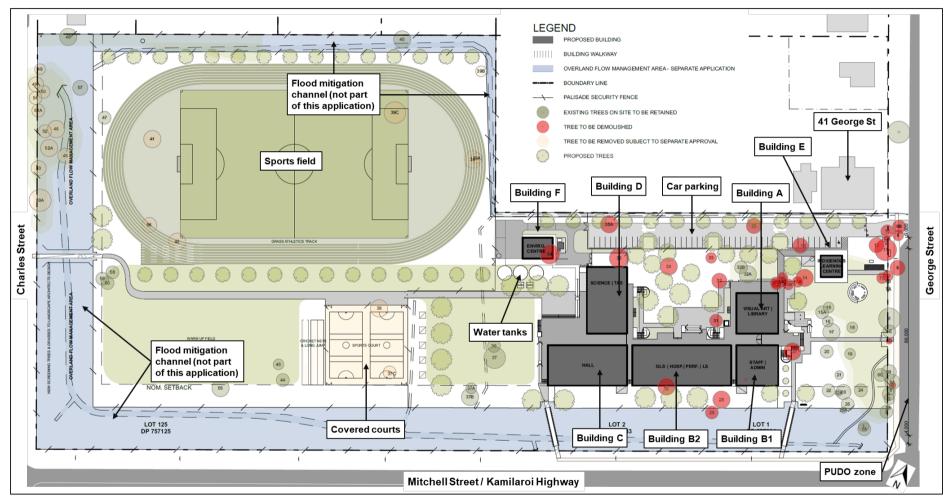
| Proposed school building and open space layout, flood channels (Part 5 works), tree removal and planting (Base source: Applicant's RRFI)
